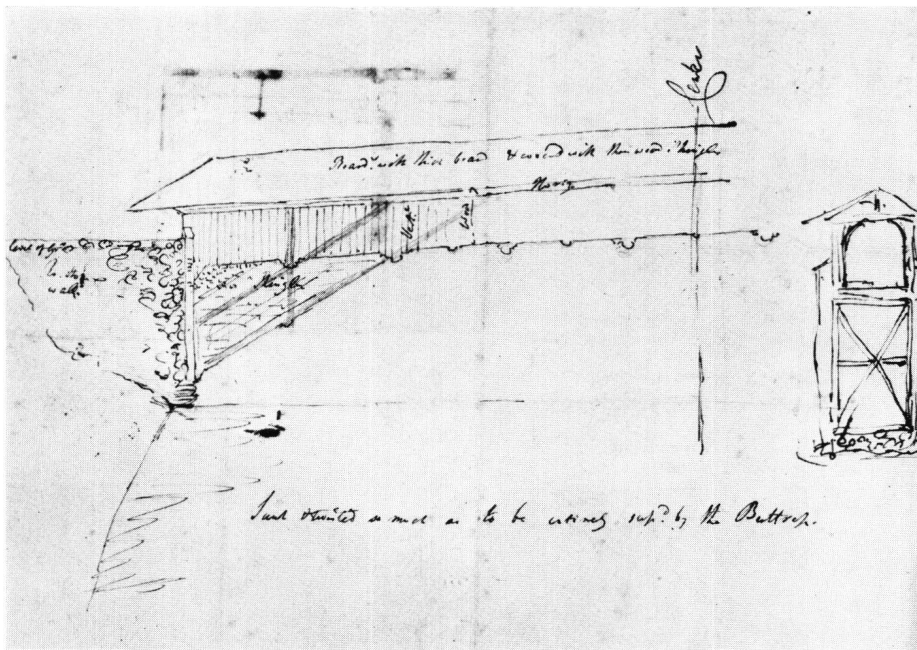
John Soane: short bridge at Reichenau; drawing showing elevation and section
